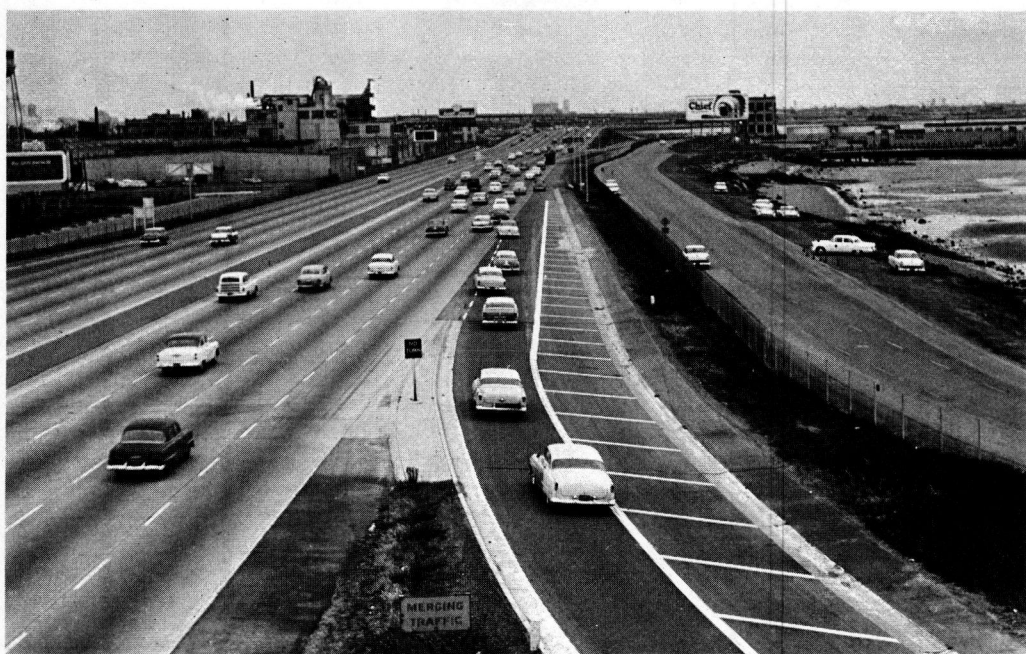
Test site with ramp curb encroaching on shoulder (2 ft from edge of freeway pavement).
